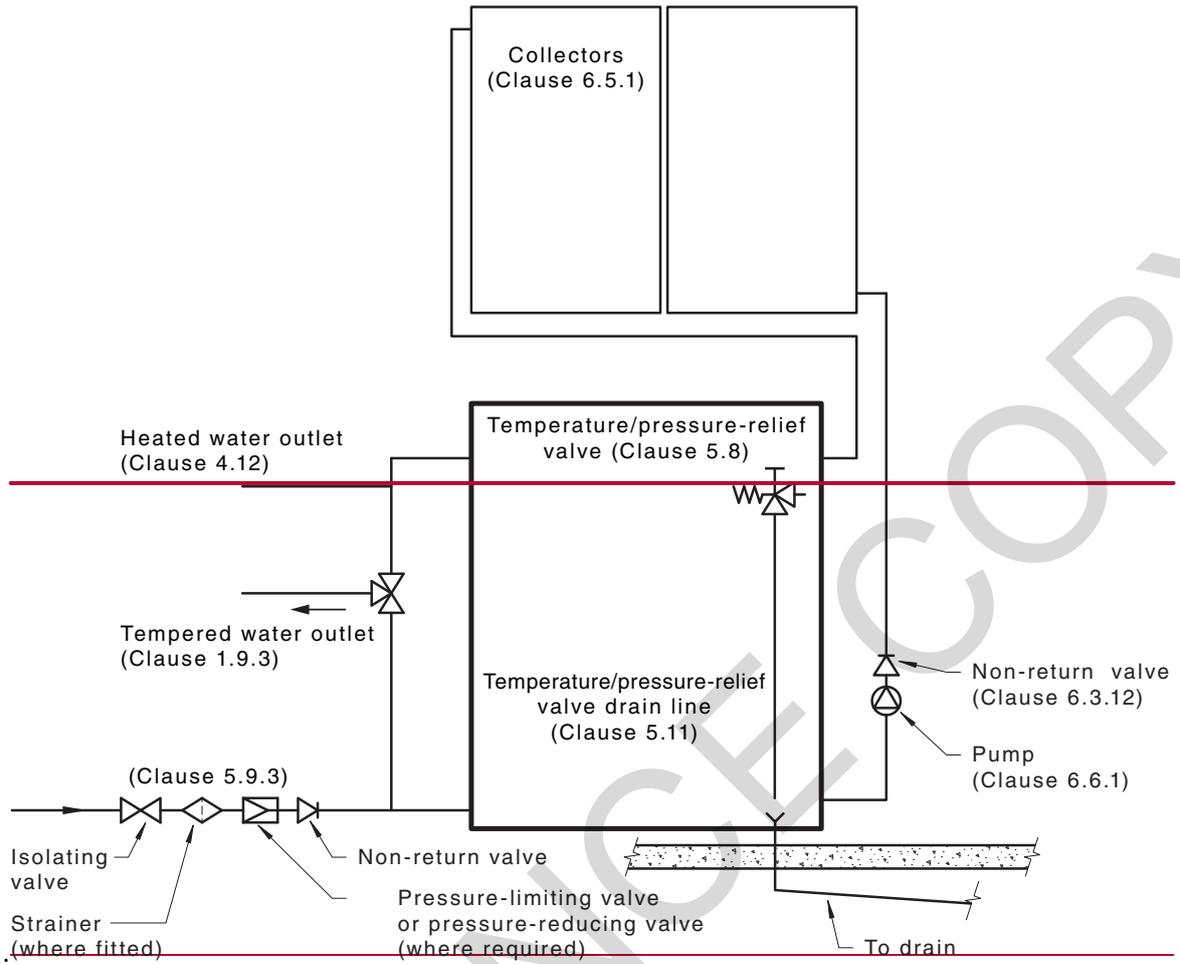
TYPICAL INSTALLATION OF A SOLAR WATER HEATER WITH REMOTE CONTAINER AND FORCED CIRCULATION
